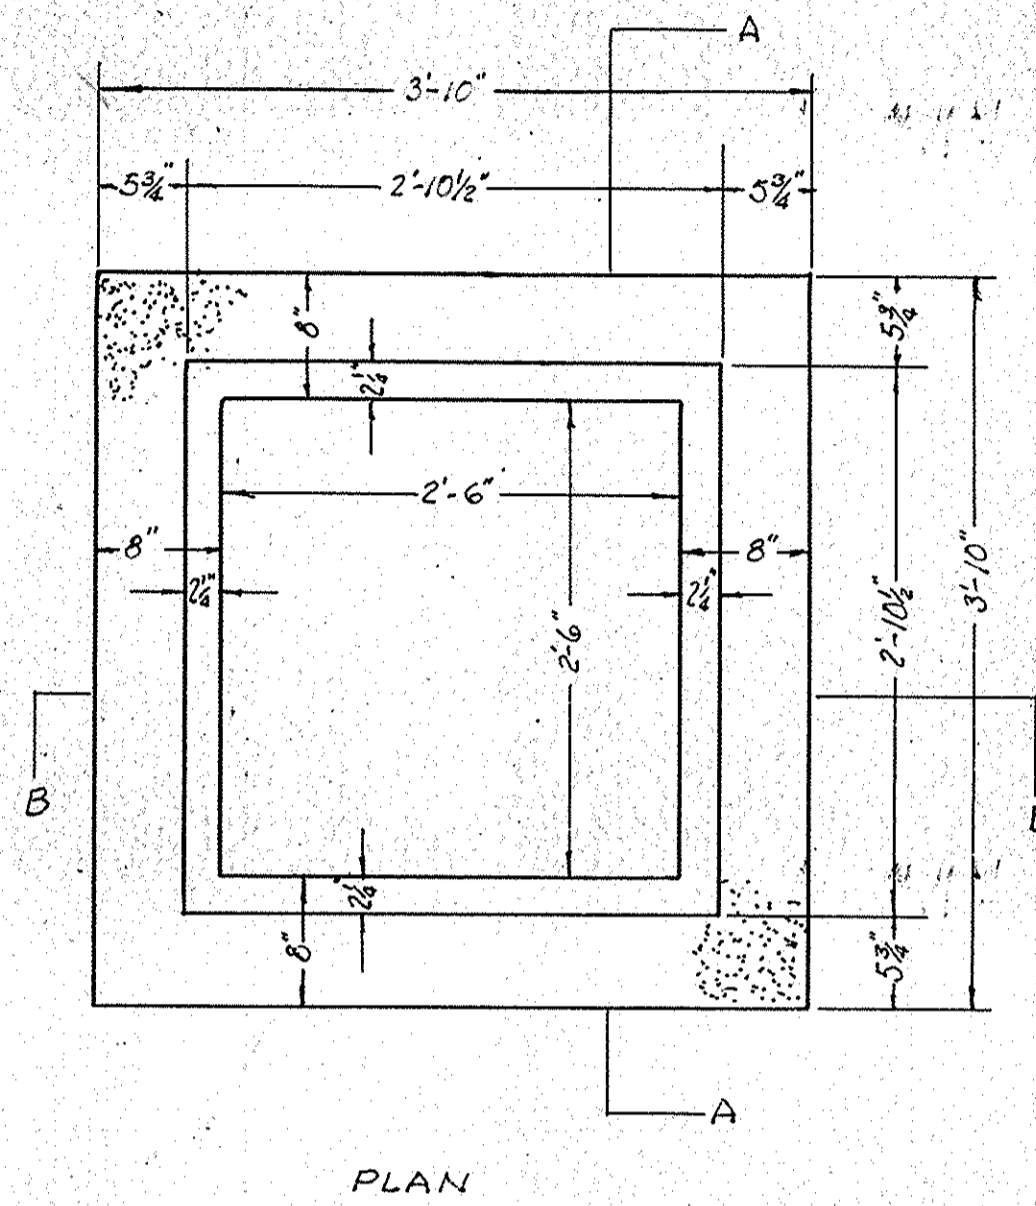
DETAIL OF CONSTRUCTION STA. 1652+50 TO STA. 1663+50
